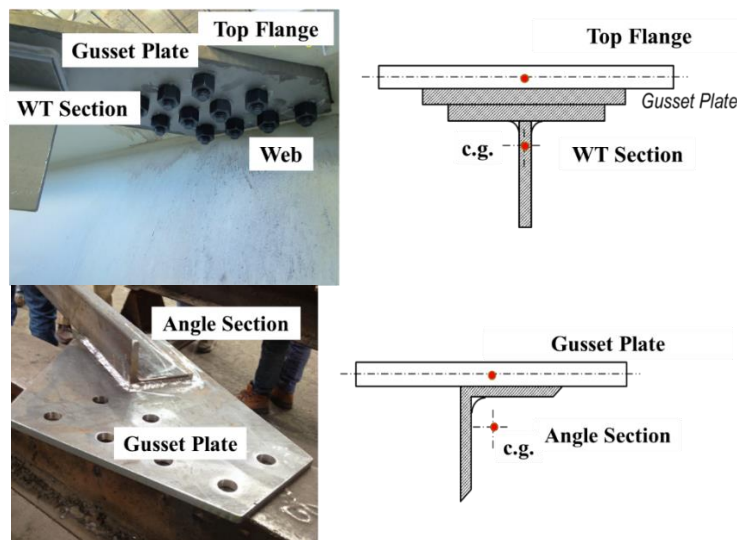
Common Bracing Members and Connection Details used in Tub Girders
